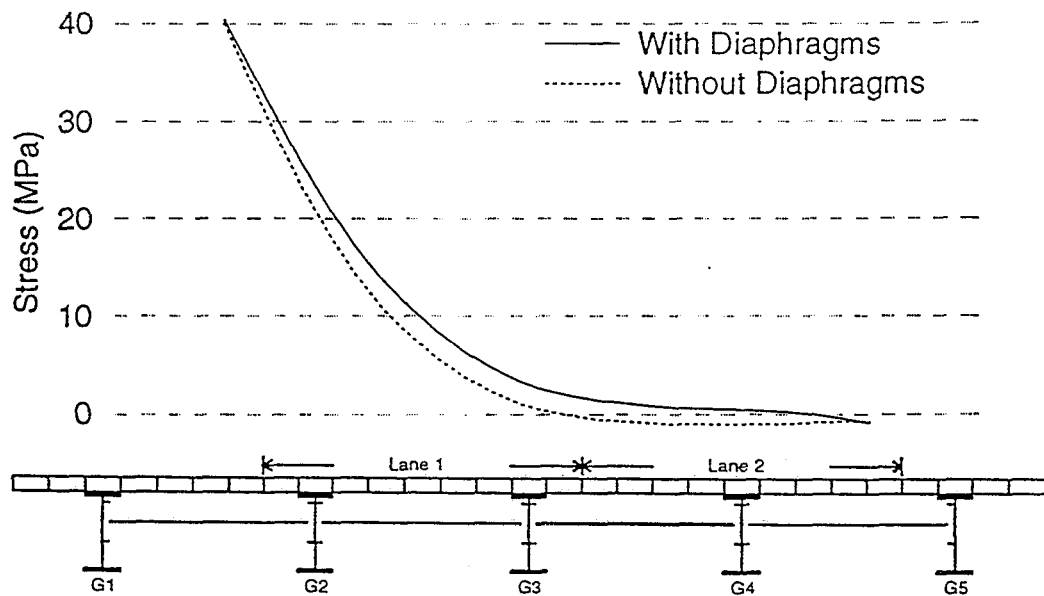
Influence Line for Bottom Flange Stress: Girder G1, Span 1, Bridge C4; Truck on Span 1
